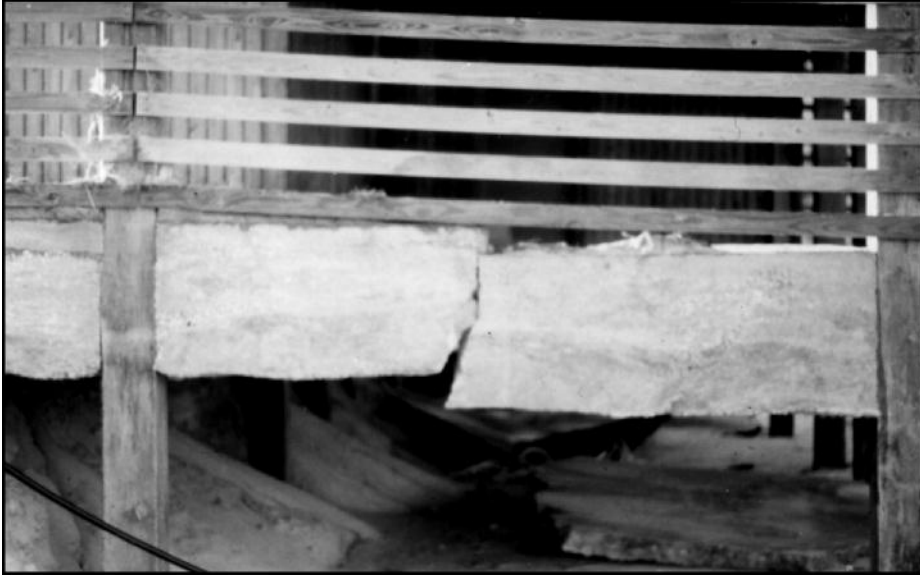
March 1989 nor'easter. This plain concrete perimeter grade beam cracked in several places.
